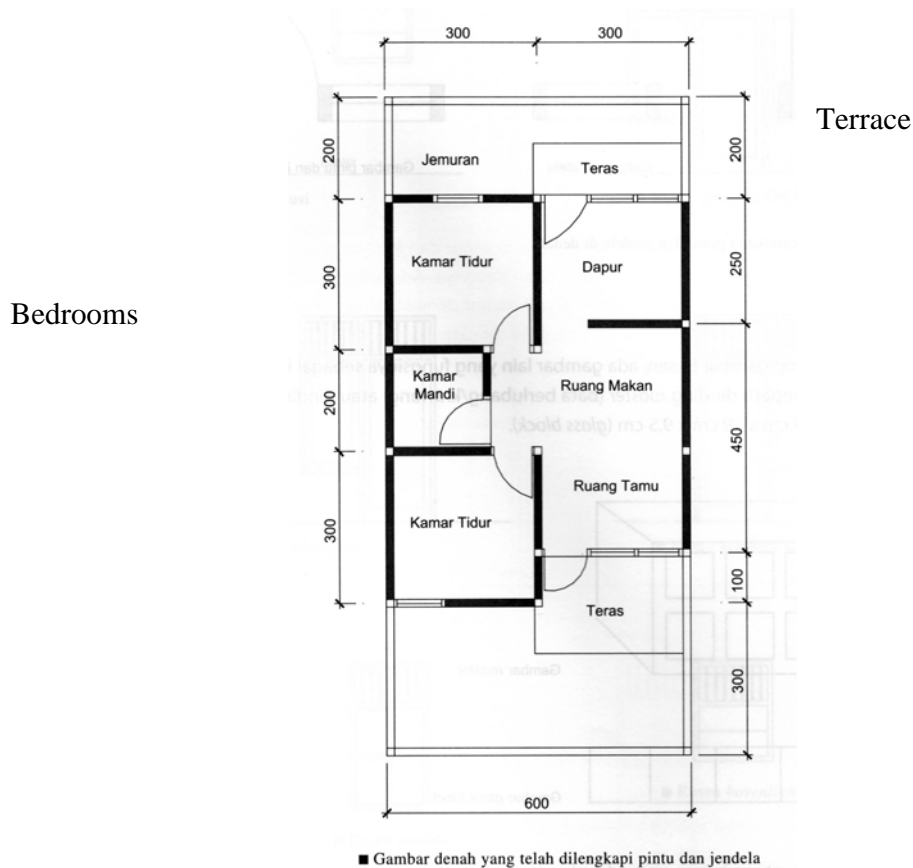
Typical Single Storey Dwelling Layout (Courtesy Griya Kreasi, 2007).
